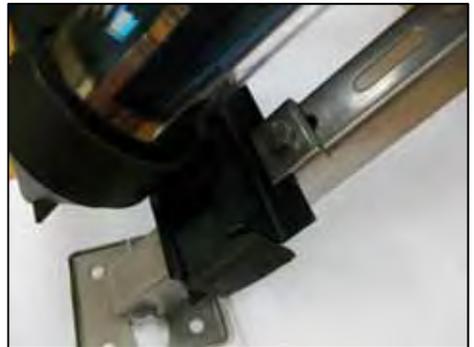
Clamp connecting evacuated tube collector to mounting rack
